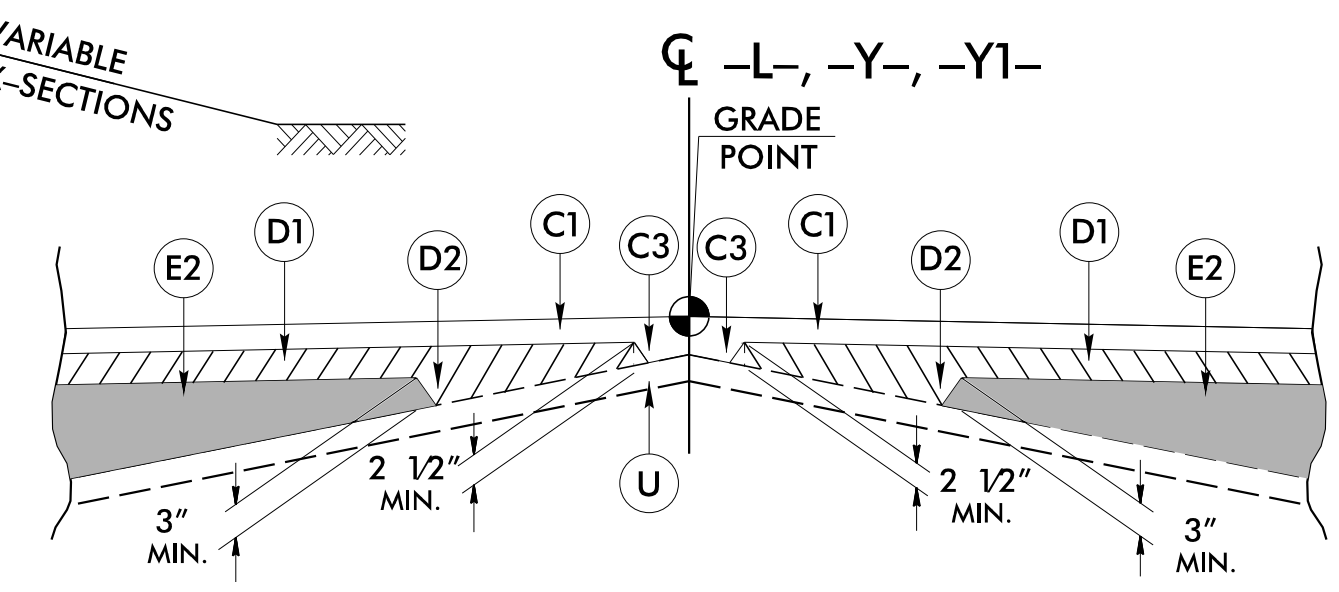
DETAIL FOR FULL DEPTH PAVED SHOULDER IN CONJUNCTION WITH GUARDRAIL
